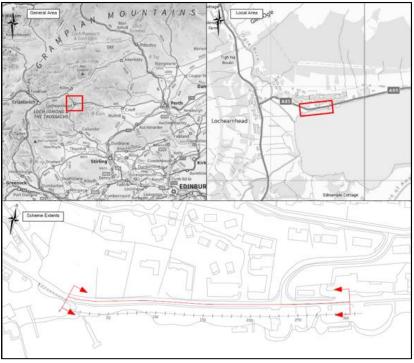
Location and scheme extent of the proposed footway works at A85 Lochearnhead. Source: BEAR Scotland. General Arrangement. Drawing 21NW/0303/012-002.
